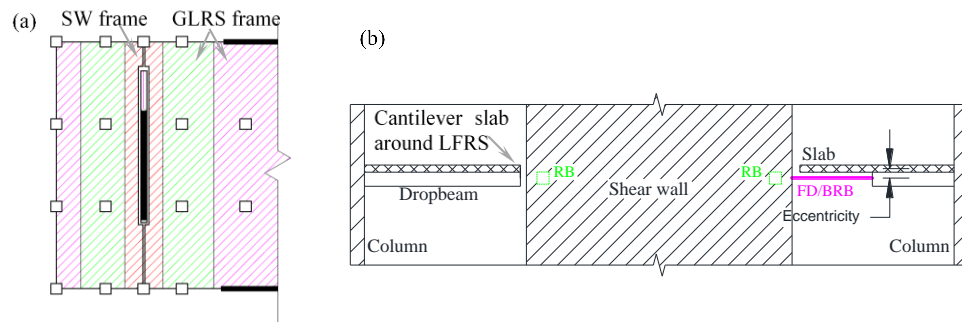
Cantilever Slab Case: (a) plan view; (b) elevation view.
